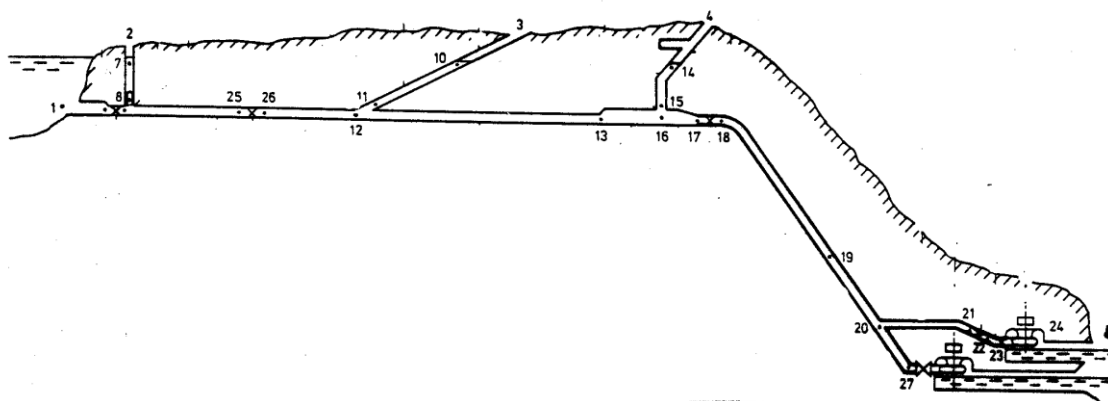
The layout of a high head Hydro Electric Power Plant.
